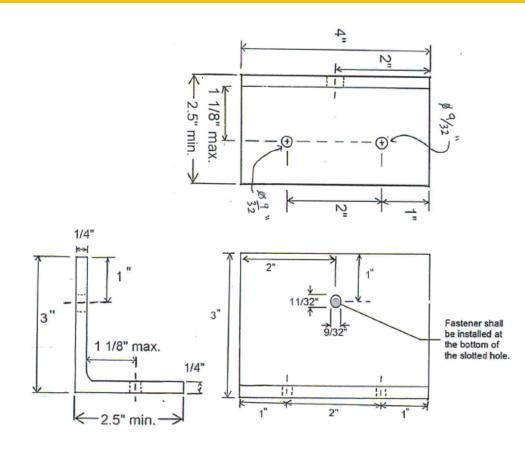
Aluminum Clip Angle for Joist to Deck Beam Connections
